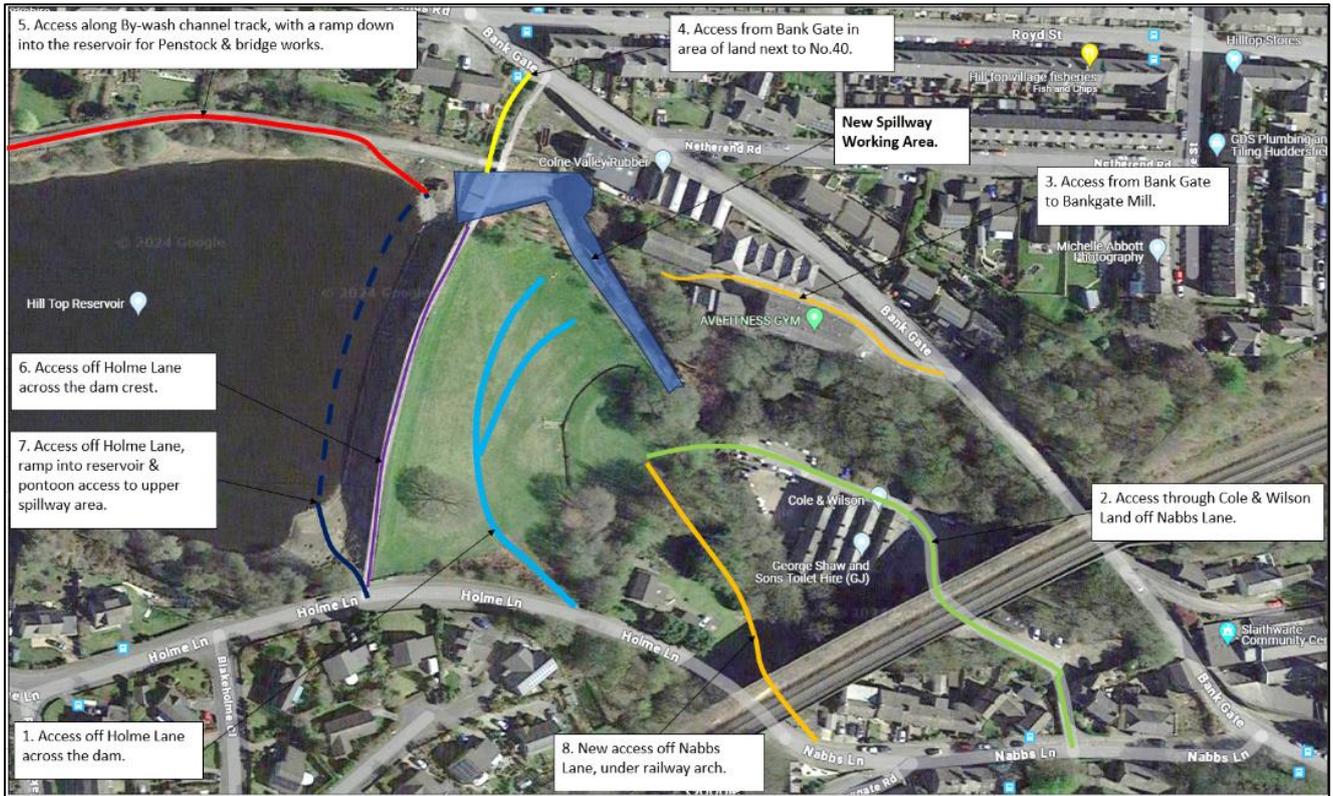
aerial view of reservoir detailing 'long-list' site access locations
